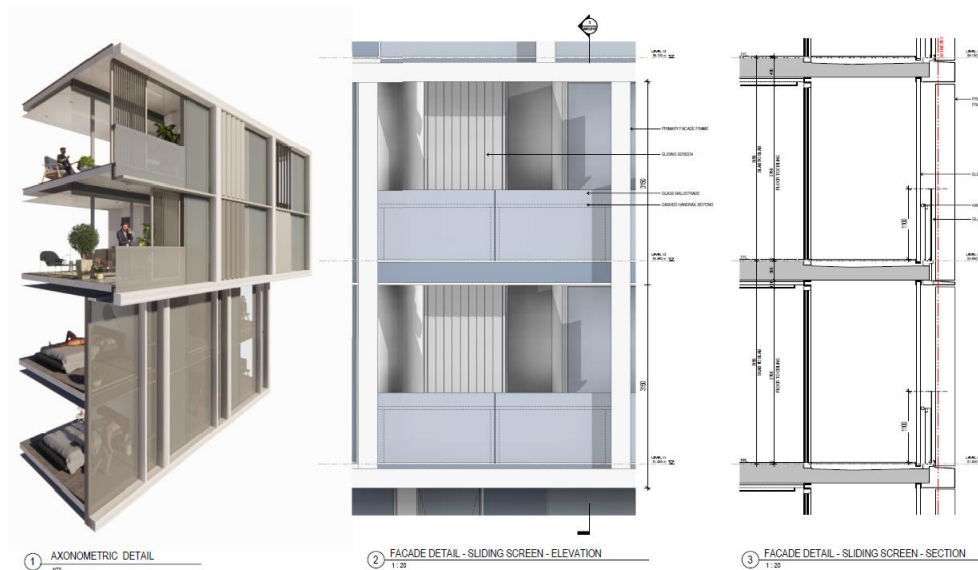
Details of proposed sliding screens submitted under D/2017/503/A
